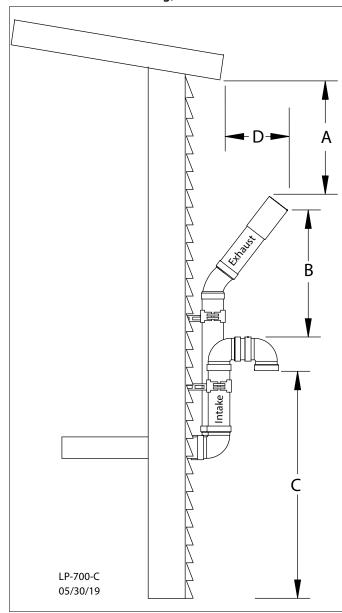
Two Pipe Sidewall (Horizontal Snorkel) Venting NOTES:
